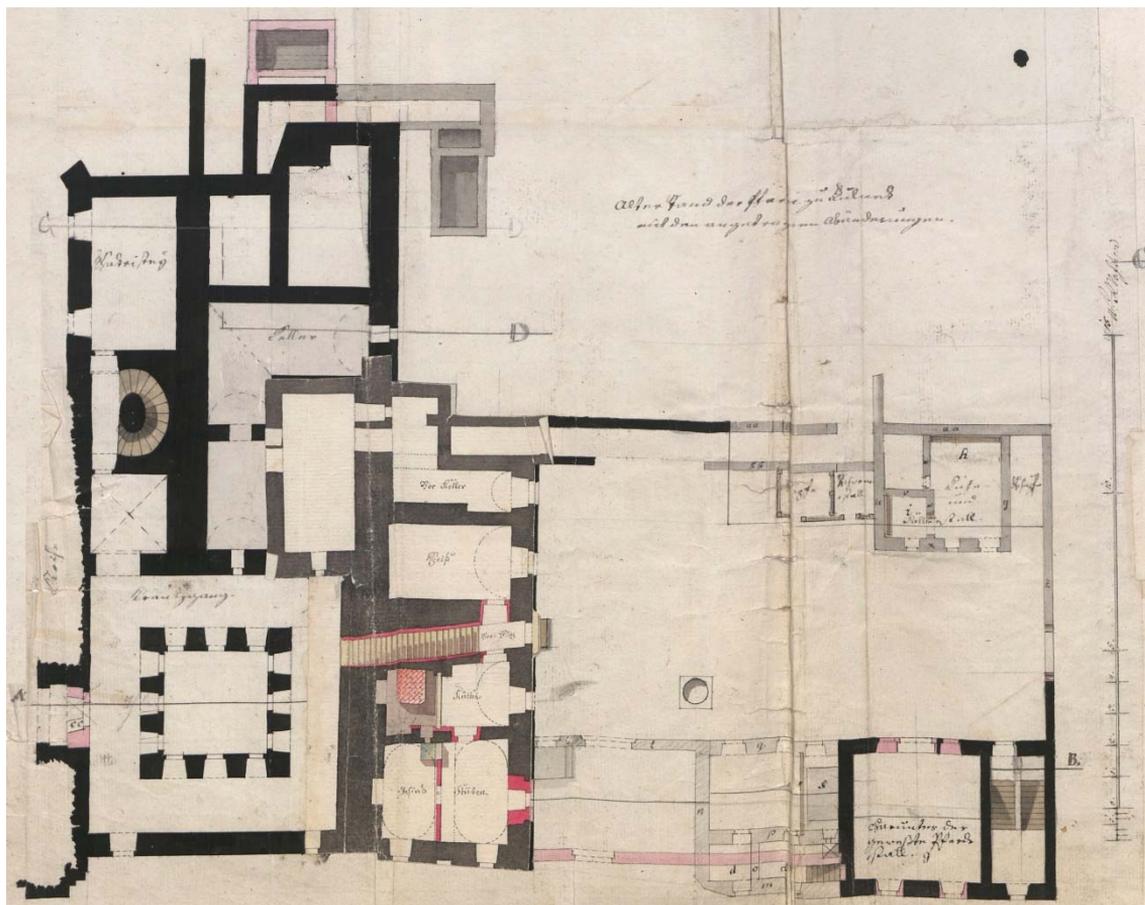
M. F. Koller, Plan and reconstruction of ground floor parish in Fulnek, drawing 1805. MZA in Brno, Fund B 15, kart. 623.
